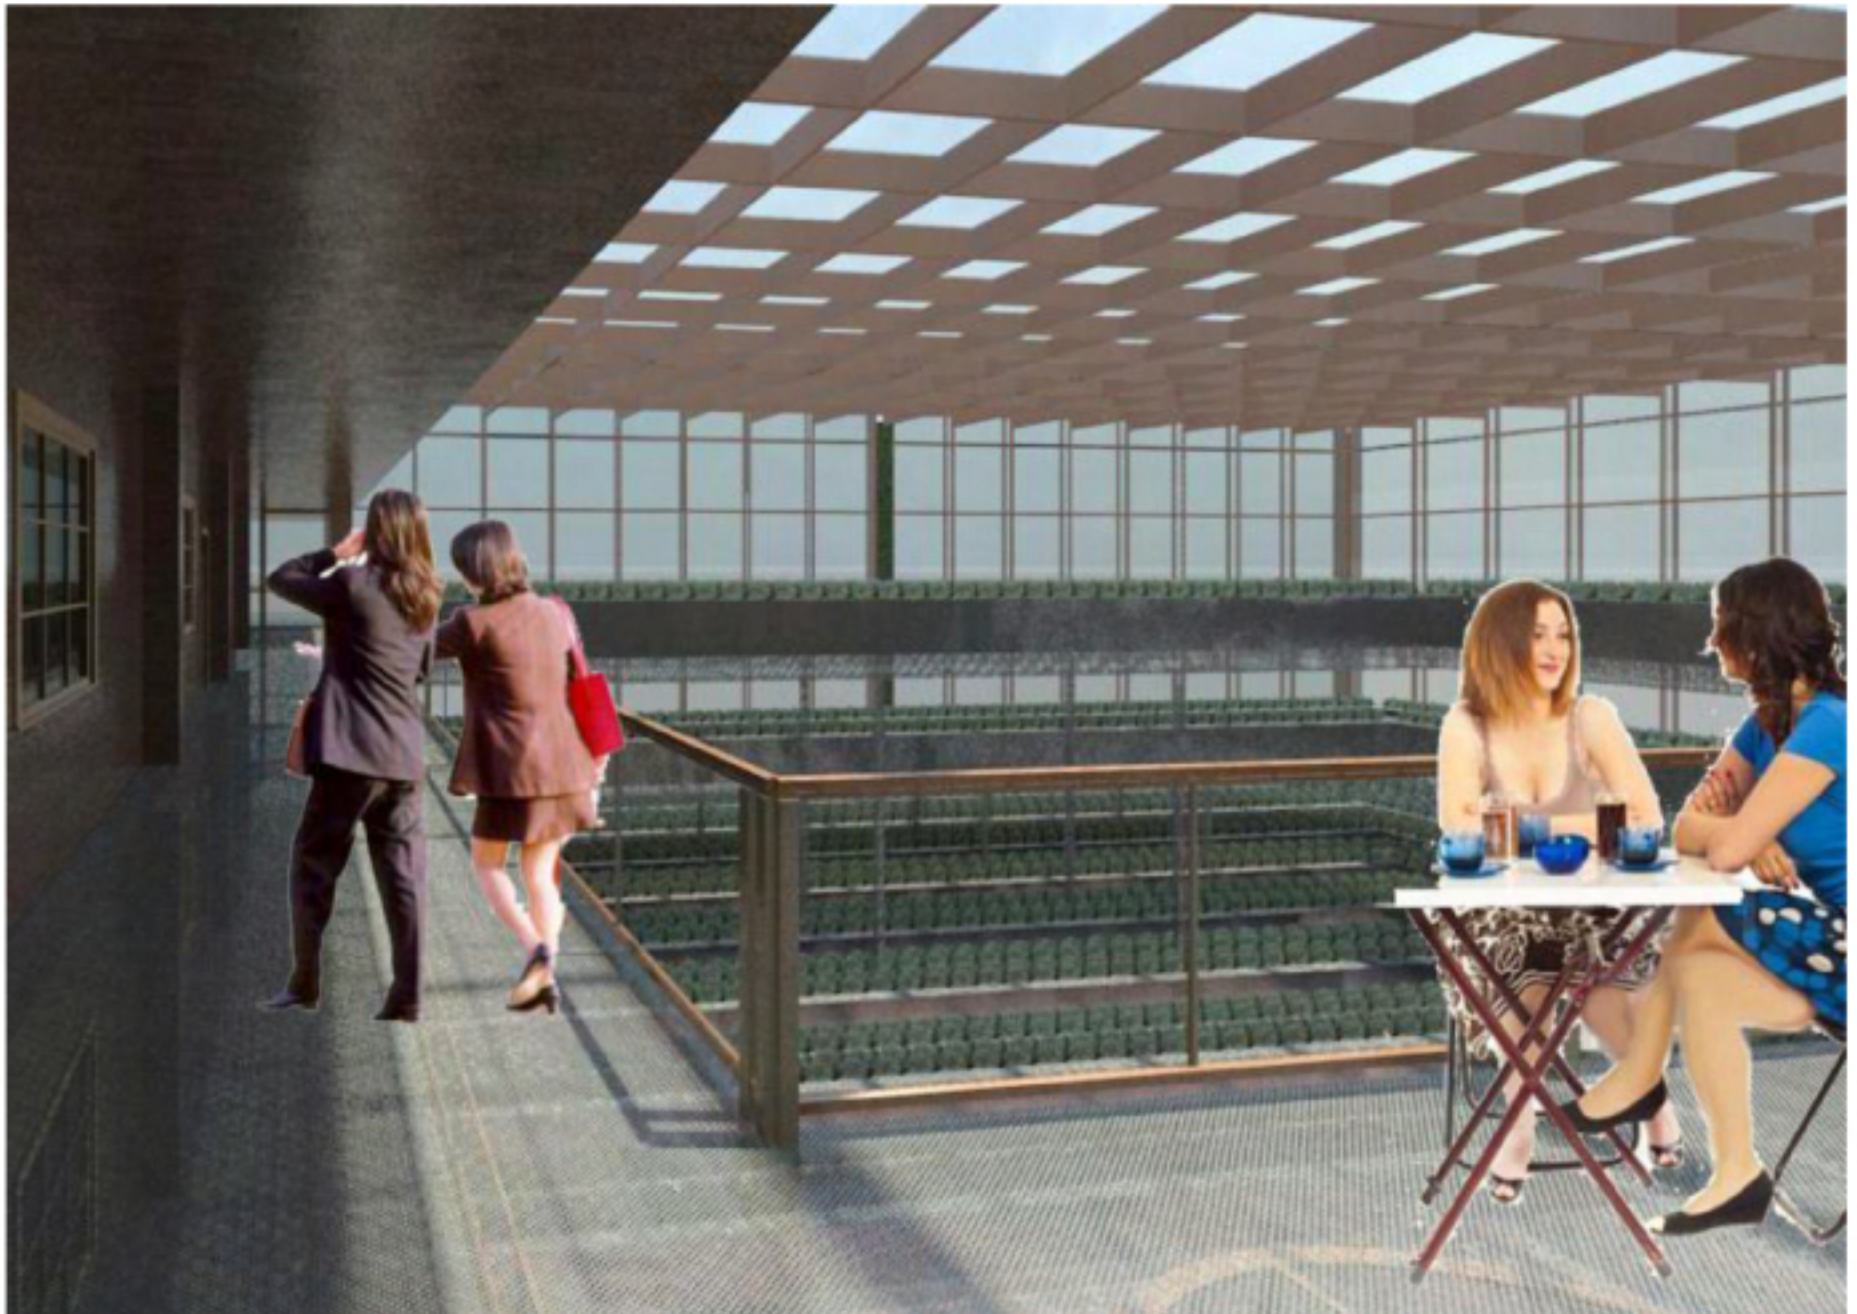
3D view from walkway along the entry to the two level apartments. Corner pushes out to allow for gathering space overlooking the agriculture zone. [Revit and Photoshop]
